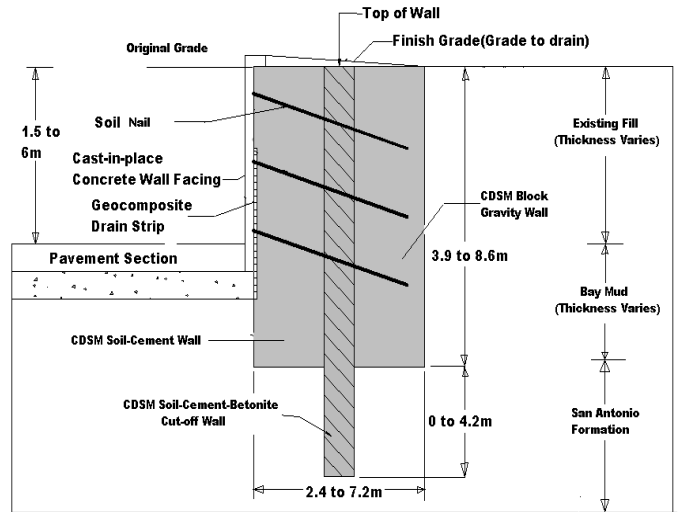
CDSM gravity retaining walls and cutoff wall for taxiway undercrossing, Oakland Airport Roadway Project
